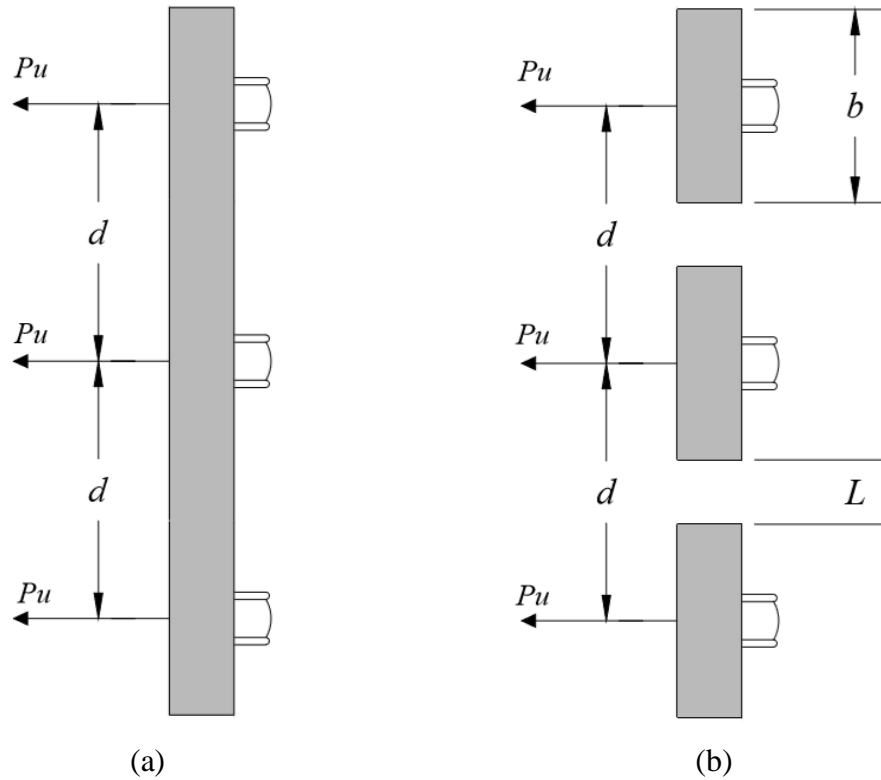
Anchor design parameters for (a) continuous wall and (b) individual anchor assumed by NAVFAC DM (1986)
